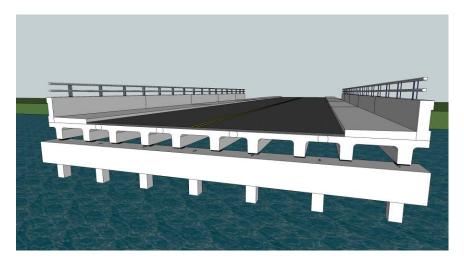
Adjacent Deck Double Tee Beam Superstructure
